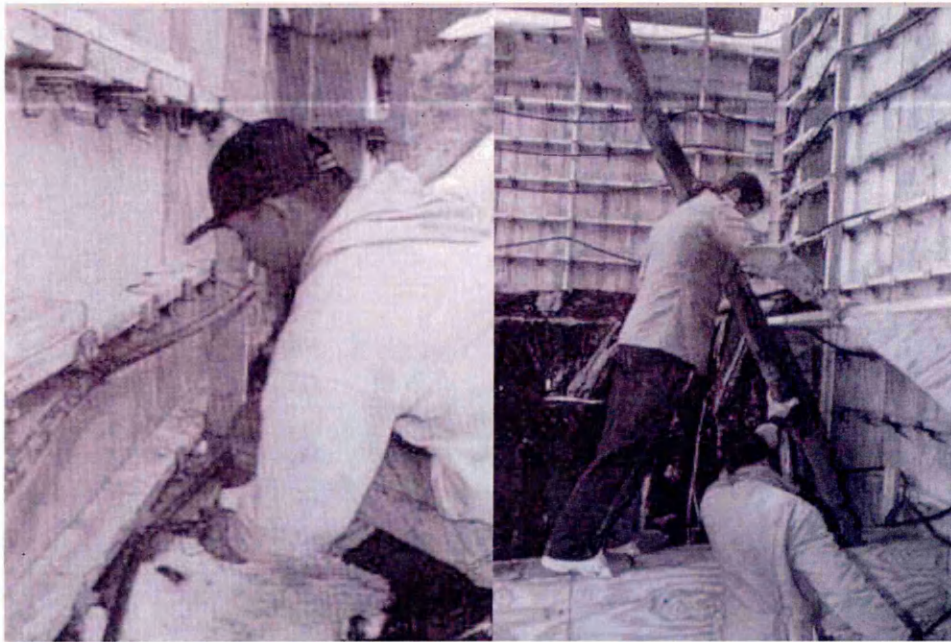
Positioning of hoses prior to casting and insulating with blankets
